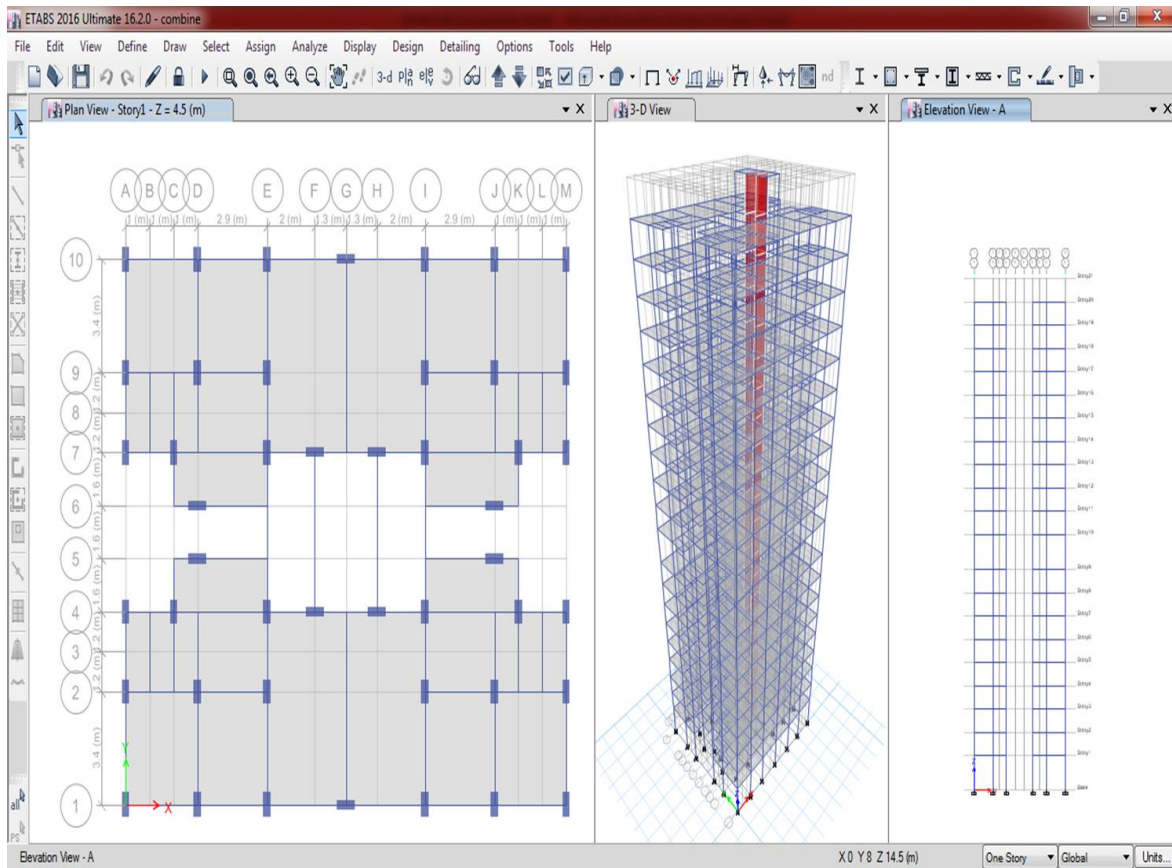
Model-1 - PLAN OF REGULAR RC BUILDING
